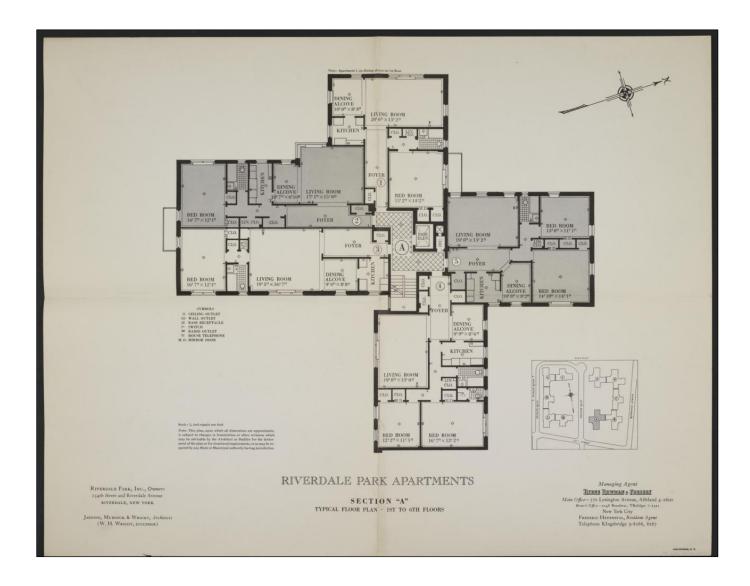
Typical floorplans in Section A of the Riverdale Park Apartments (Jardine Murdock & Wright 1939).
